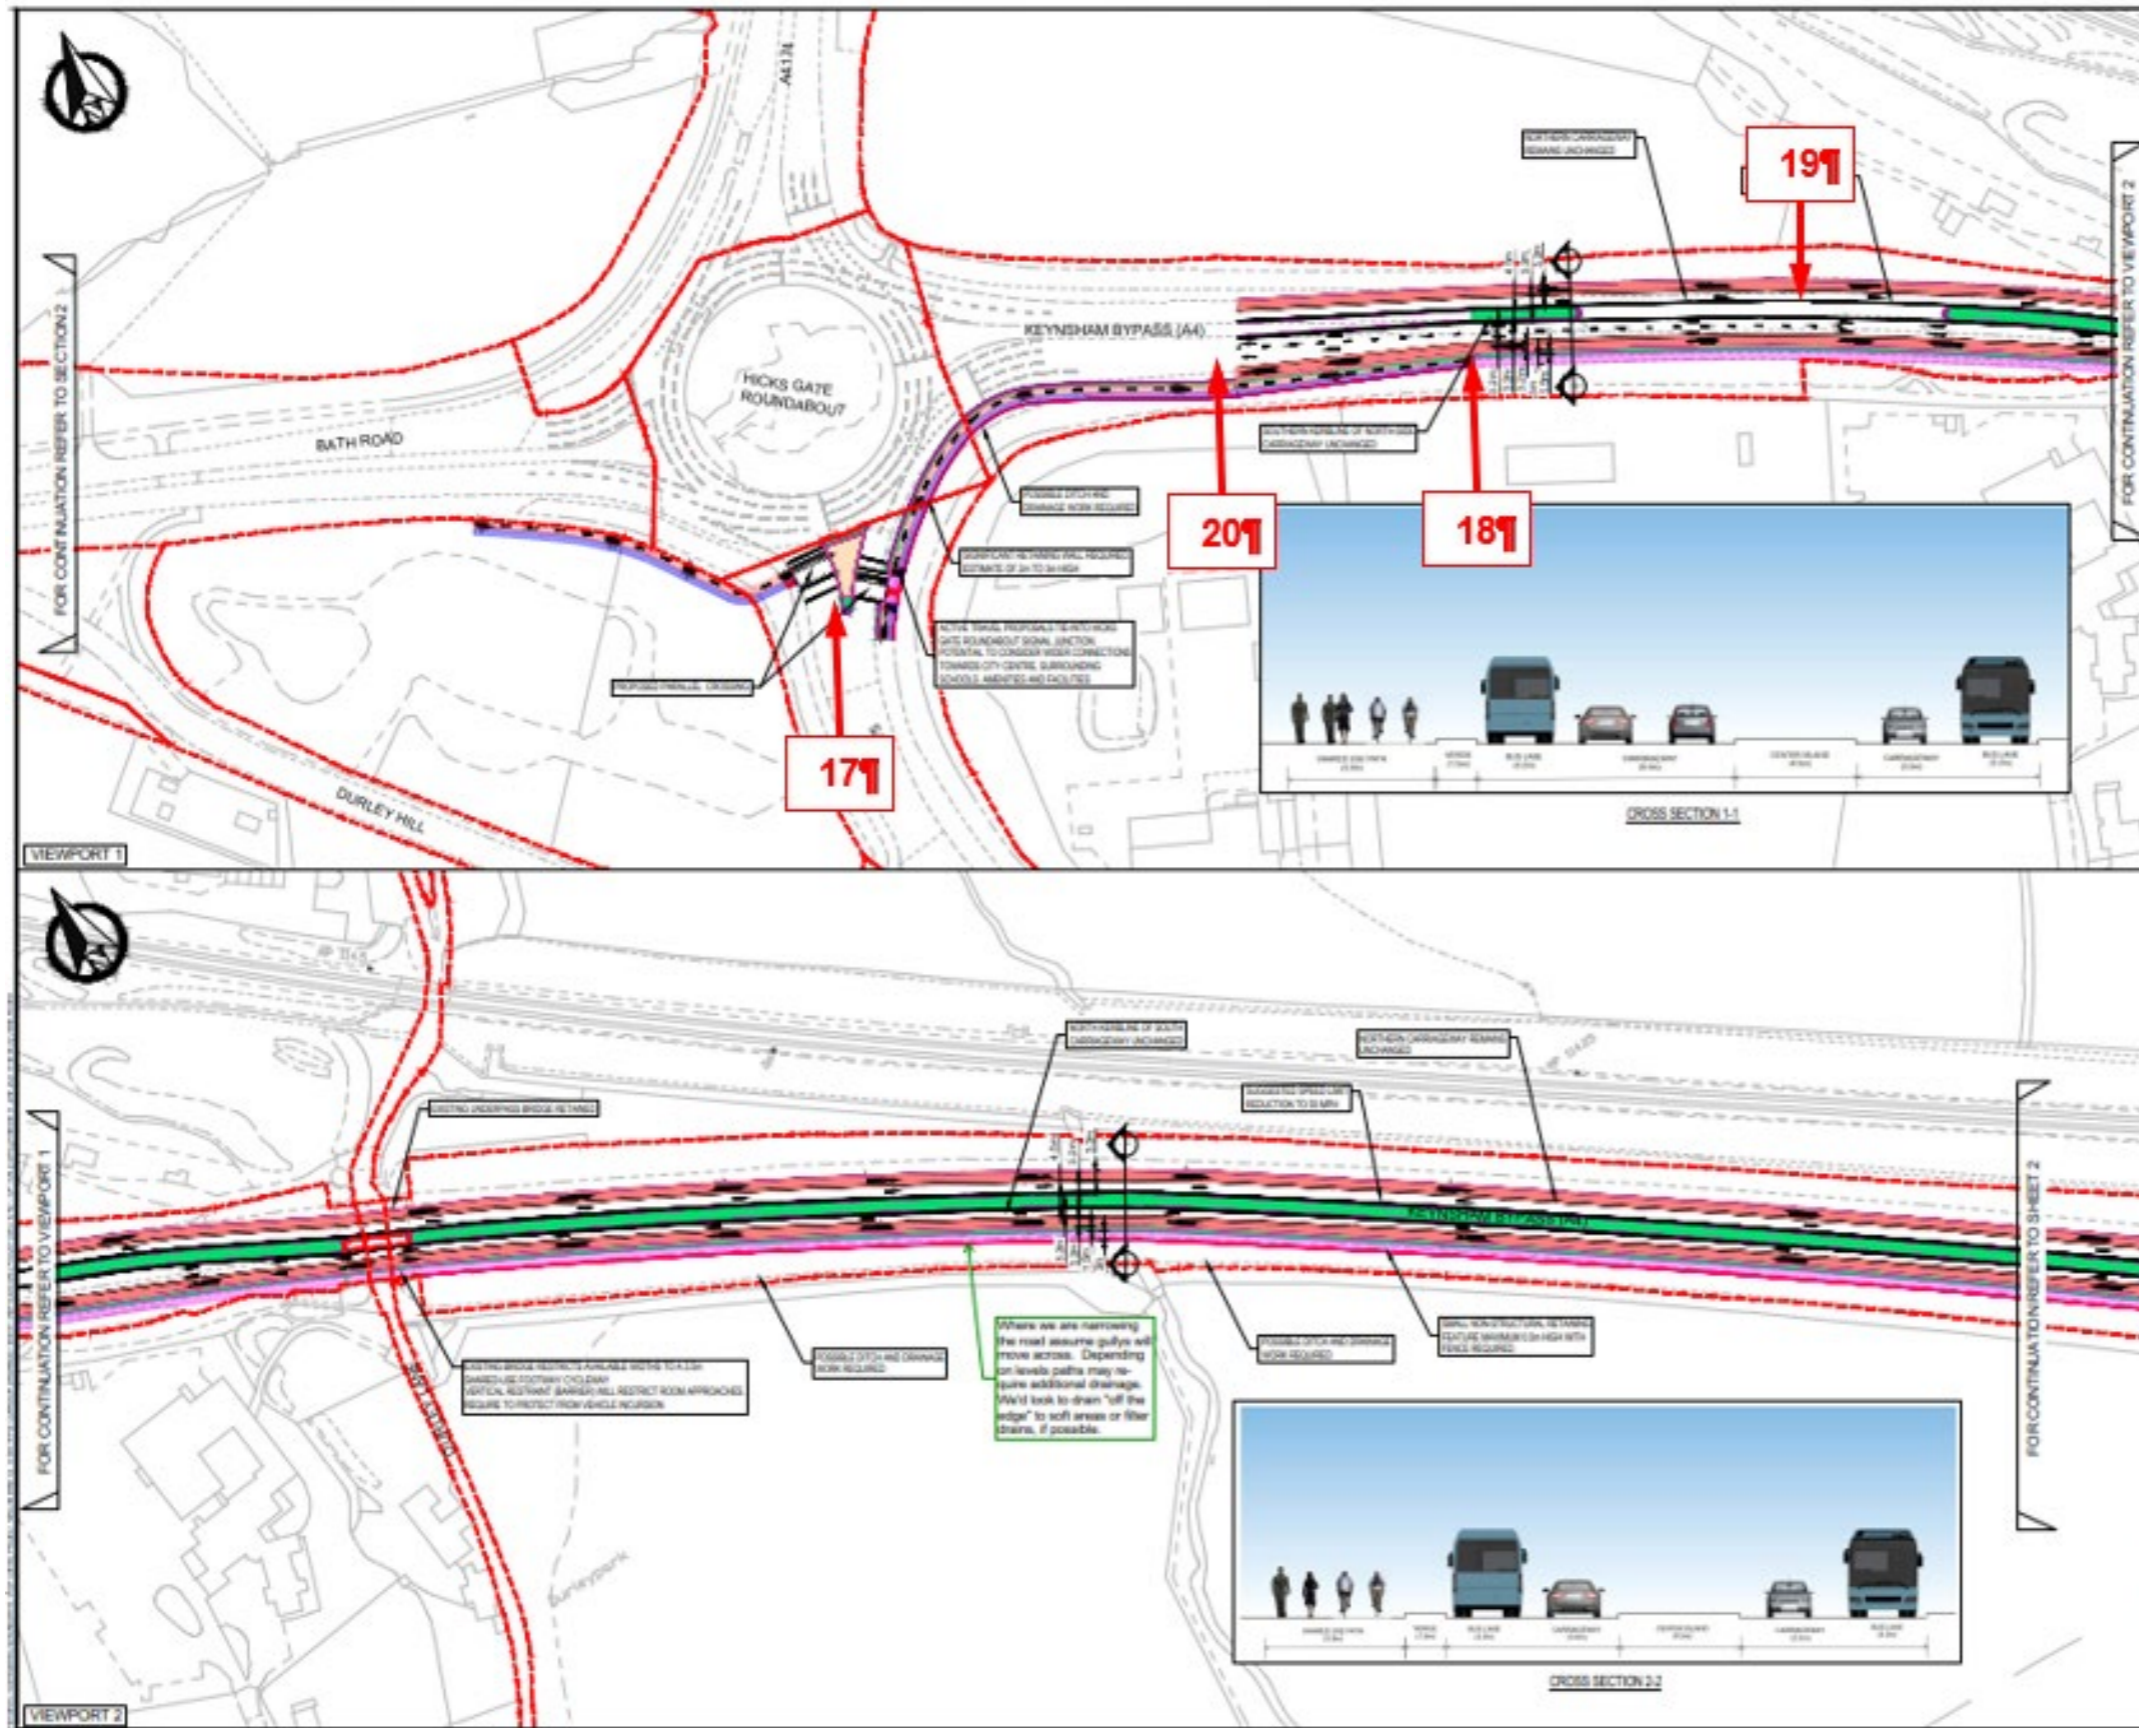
Section 3 Road Safety Audit Problem Location Plan
